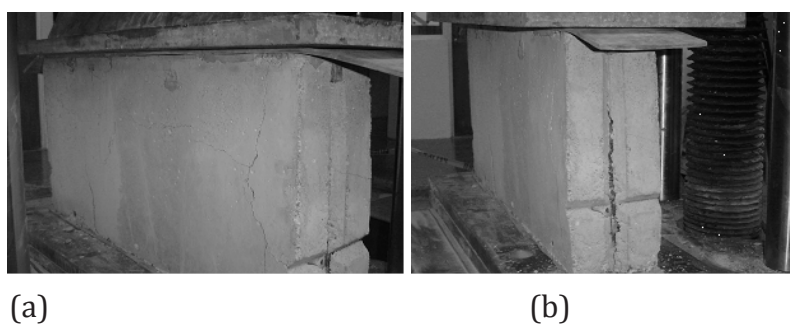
(a) Crack pattern of concrete masonry lightened with PET containers subjected to compressive strength. (b) Vertical crack in the plane of the PET containers.
